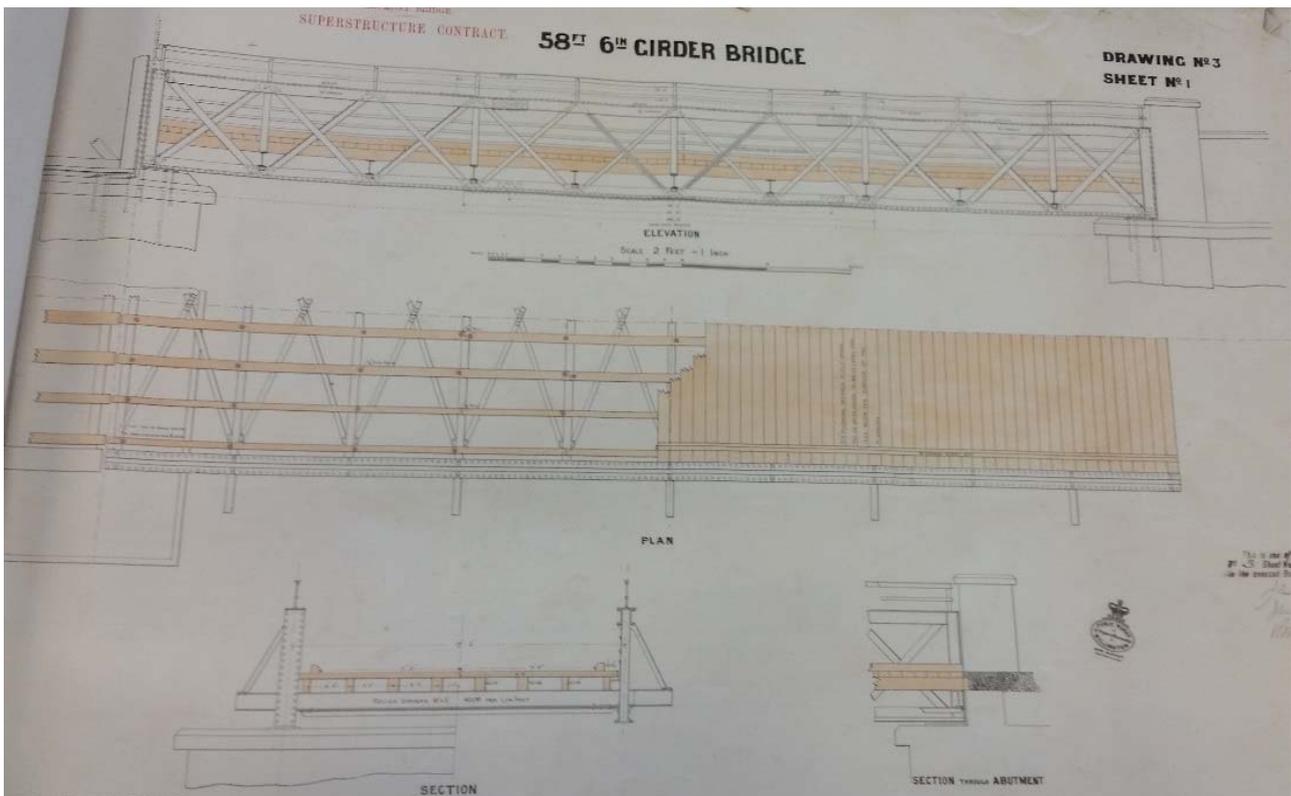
Plans, sections and elevations of the 58ft 6in lattice girders of Beaumont Bridge.
